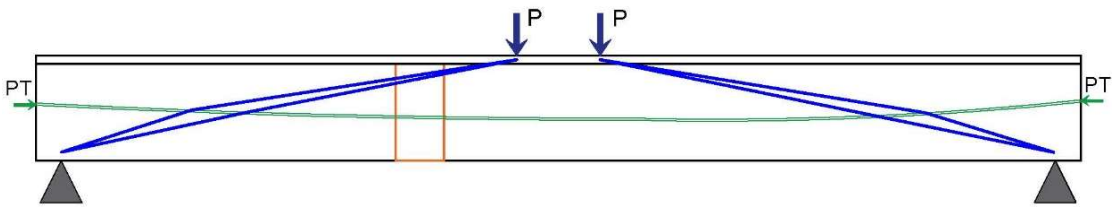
(b) and (c) present the sub-truss geometries for the general slab-on-spliced prestressed concrete girder bridge. In order to incorporate both truss action and arch action, two main sub-trusses are required. First is the truss effect which incorporates the effects of the concrete compression chord, diagonal concrete compression struts, longitudinal and transverse mild steel, and pretensioning strands (Fig. 6.1 [b]). Second is the arch action effect which also incorporates any effects of post-tensioning (PT) ducts (Fig. 6.1 [c]). Given the draped nature of PT ducts where the c.g.s. elevation may vary along the length of the span, it may not be feasible to lump PT actions at either the top or bottom chord as part of truss action. Therefore, it is necessary to represent the PT as part of the arch sub-truss. In order to provide strain compatibility, the associated nodes of each sub-truss are restrained to move equally.
